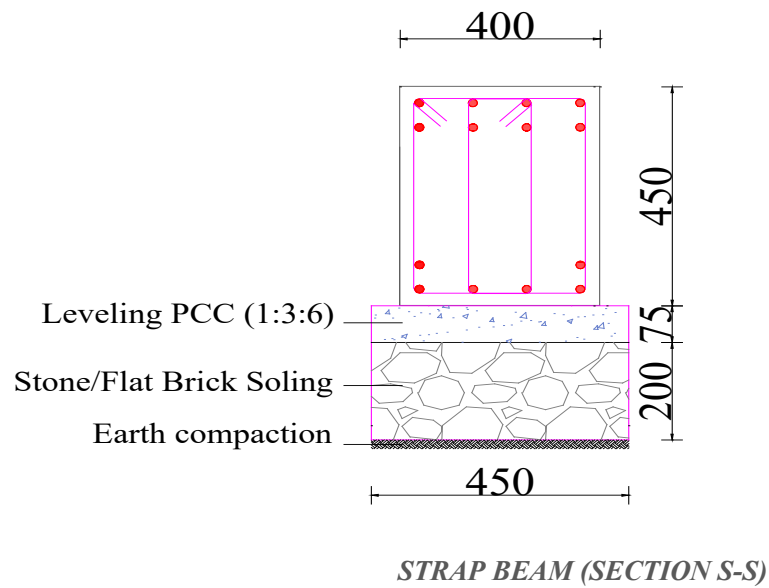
(B) TYPICAL ECCENTRIC FOOTING DETAIL
